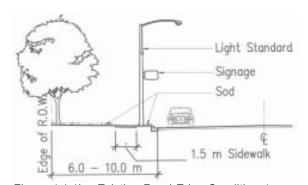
Existing Road Edge Condition 4 Sidewalk with no Splash Strip
